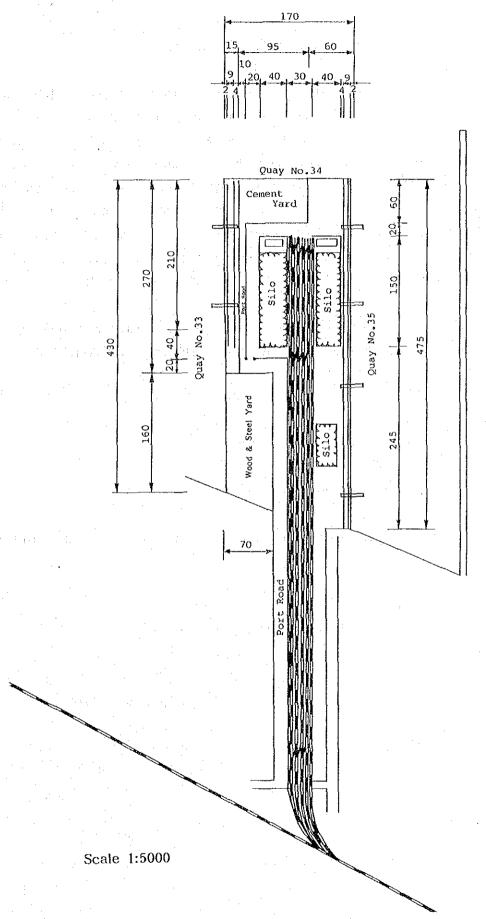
Layout plan of the Main Facilities for the Cereal Terminal
